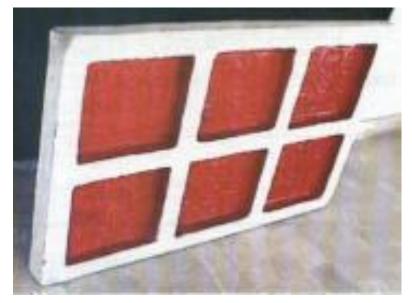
PRECAST REINFORCEMENT BURNT CLAY BRICK WAFFLE SLAB TILE FOR ROOFING
